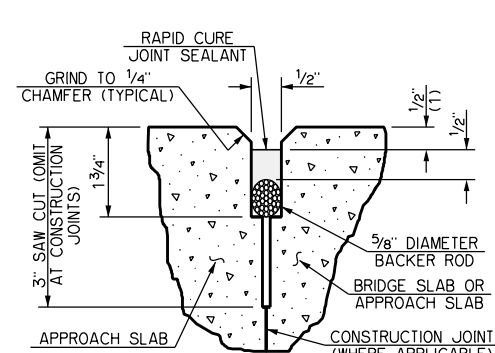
DETAIL OF APPROACH SLAB AT ABUTMENT WING
